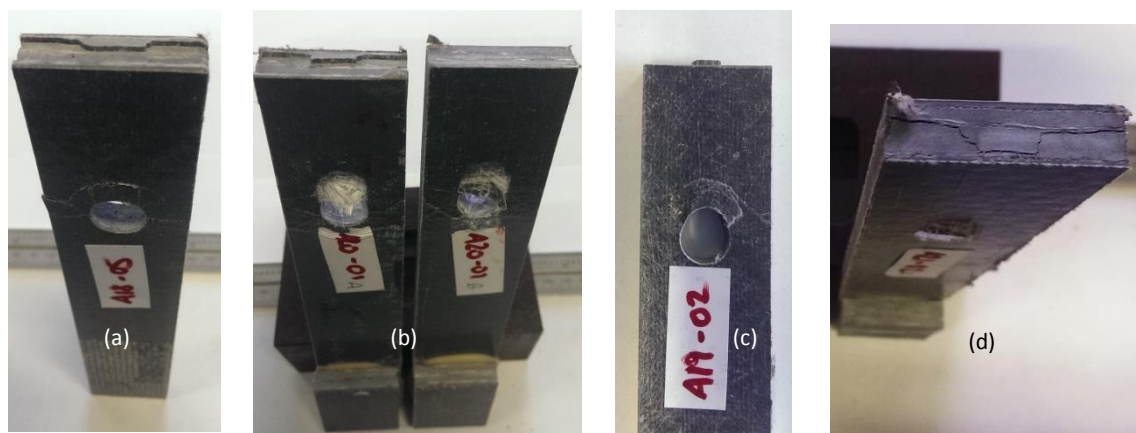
Single Bolt Failed Specimens for (a) Web DL, (b) Web SL, (c) Flange DL and (d) Flange SL
